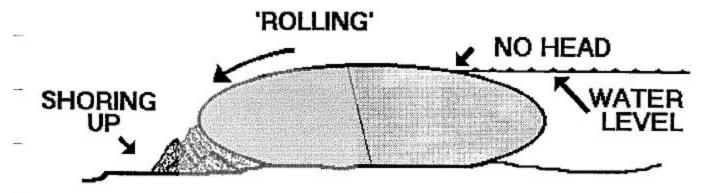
A cross section showing the placement of dirt/rock to shore up a water structure that shows signs of rolling. Other temporary solutions to rolling are the use of available heavy equipment as barriers or by installing a second structure behind the moving structure, immediately.
